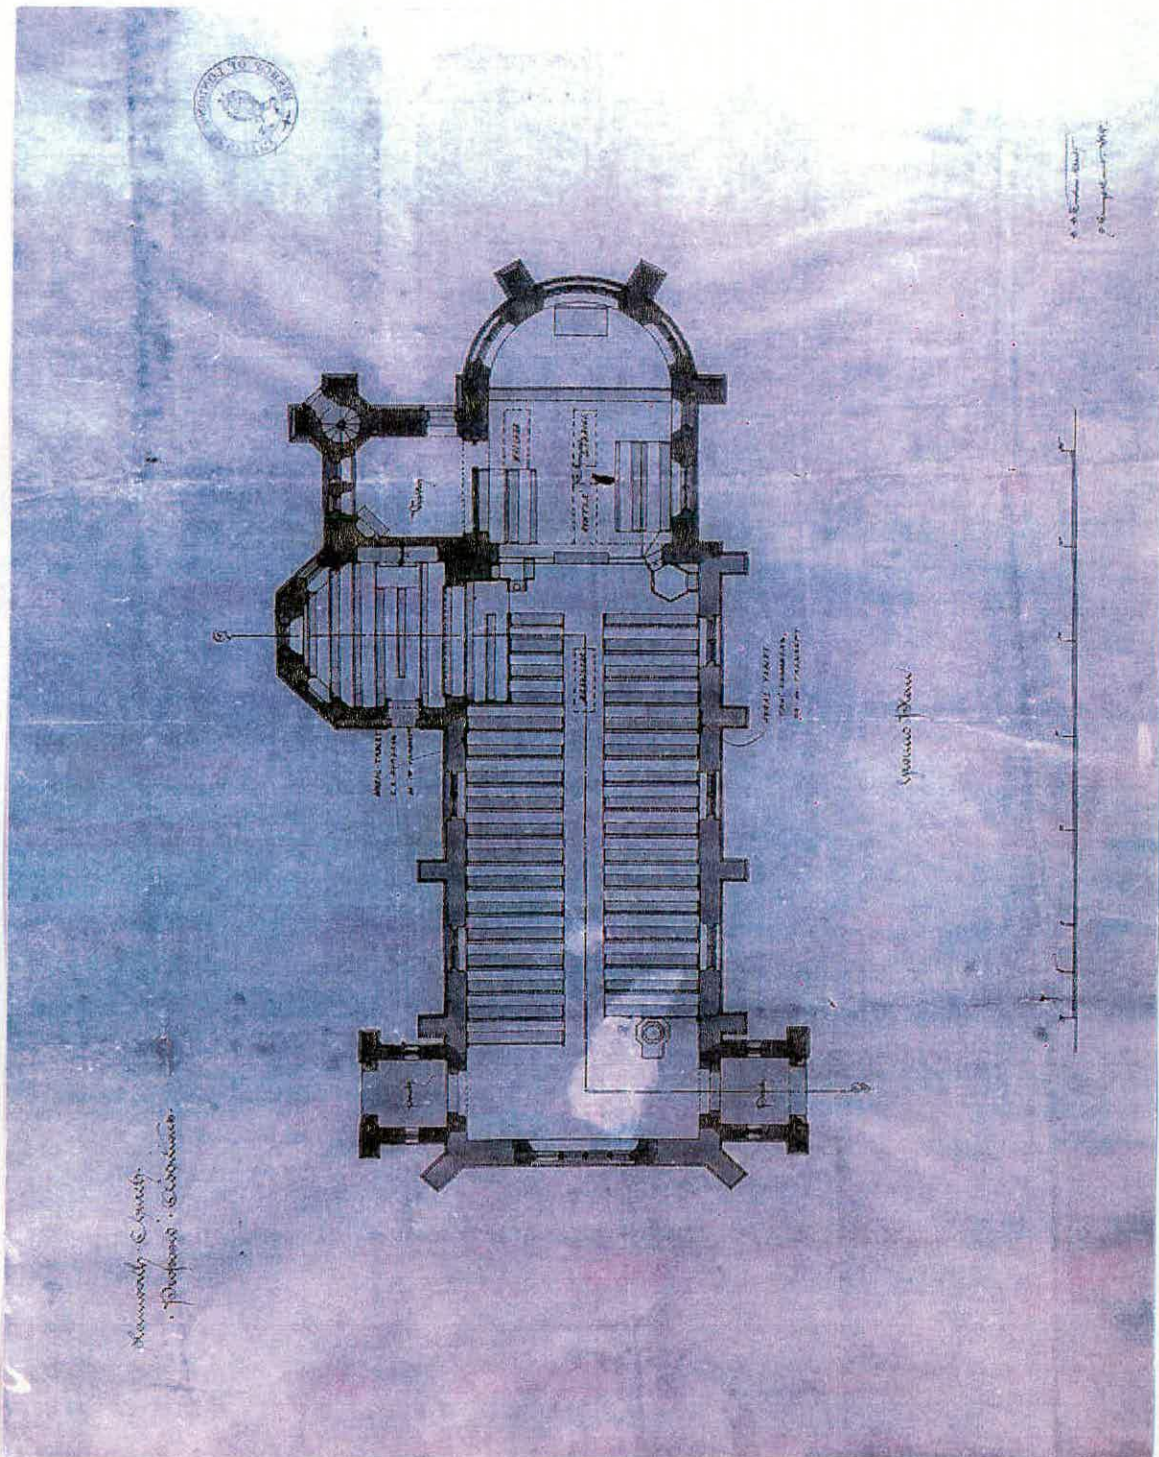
, a plan for 'Proposed Additions' to Hanworth Church by SS Teulon, c. 1865 (Guildhall Collection)
